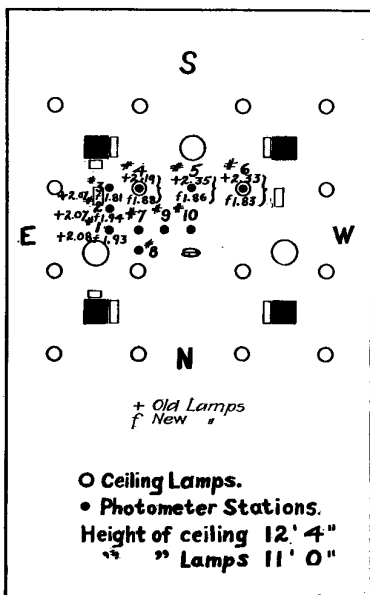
Section plan of eighth floor, (main restaurant), showing location of furniture, pillars, lighting units, test stations and illumination data.
